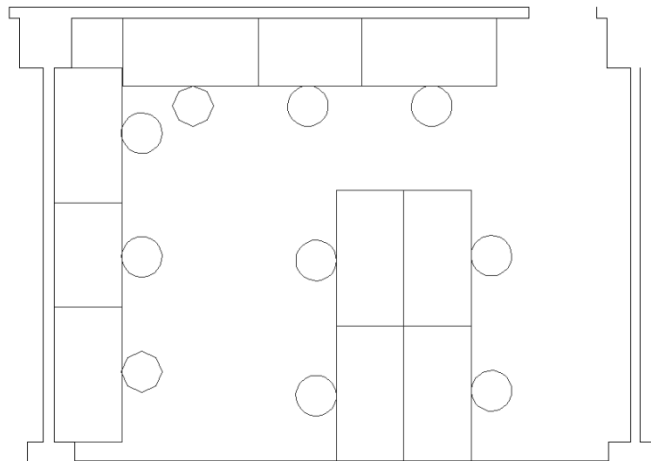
Floor plan of UCL office room in AutoCAD format.
